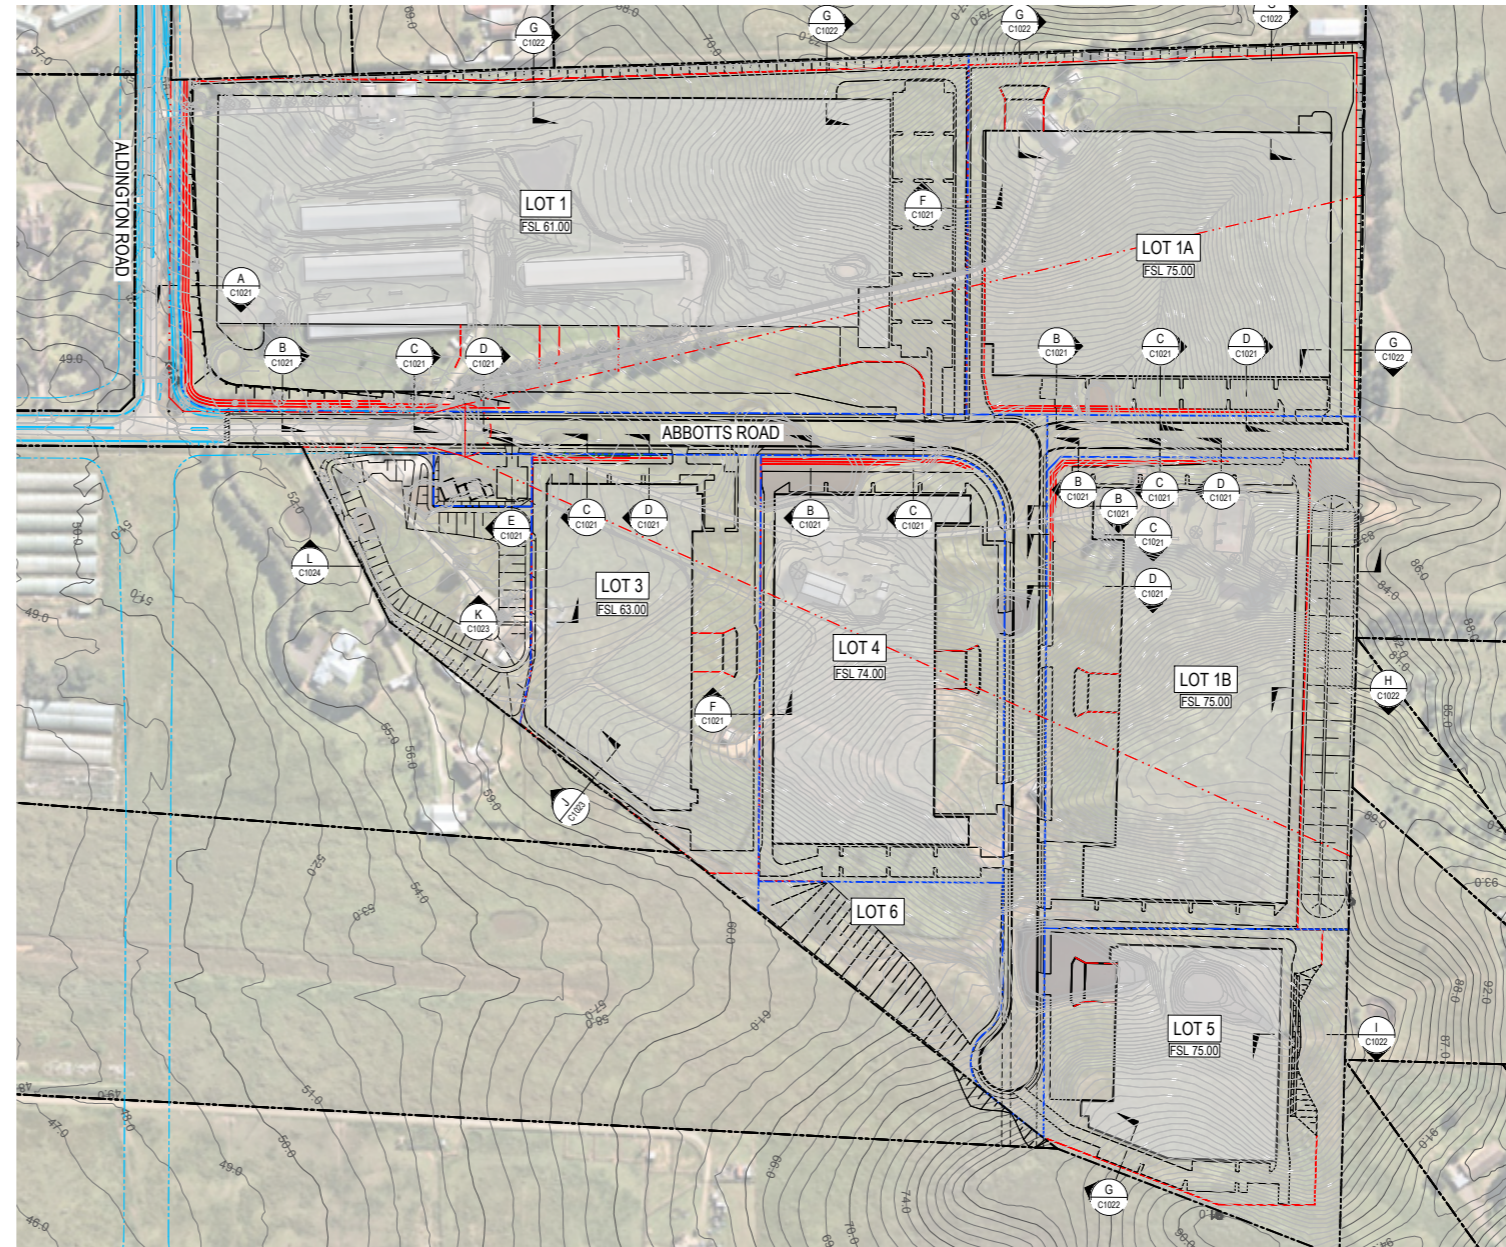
General Arrangement Plan 1:5,000 [sourced from AT&L Engineers]
